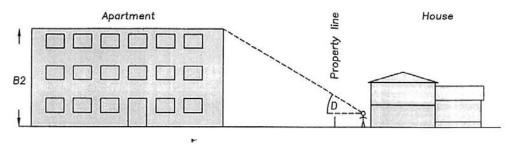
Illustrating section 5.11 of Schedule B Height limits on apartment buildings
